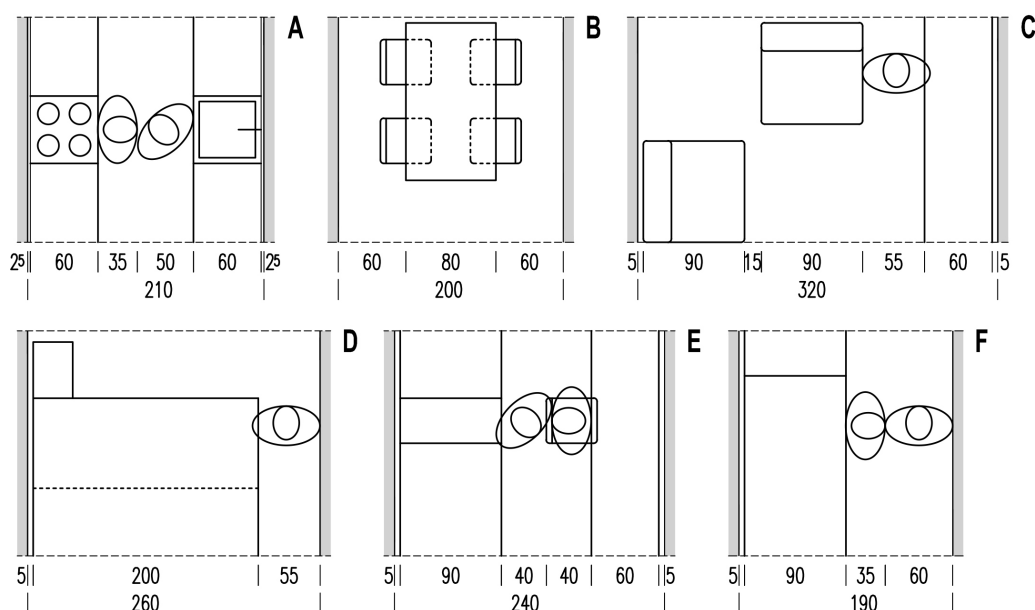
Minimum linear width of a room: a) two-row kitchen, b) dining room, c) living room, d) parents' room, e) room with 2 single beds and f) a room with a single bed (Source: Čanak, 2014)
